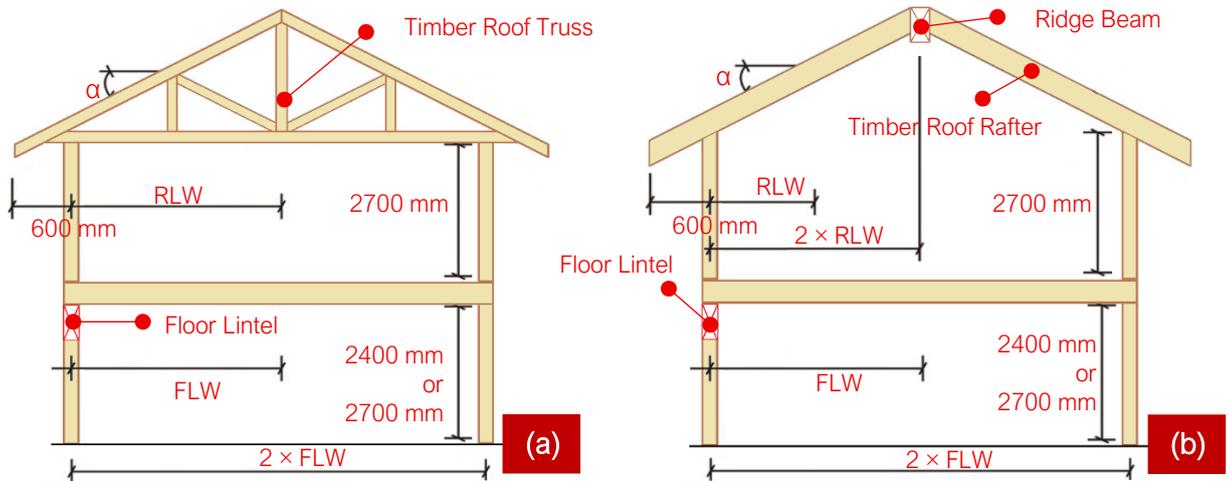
Red Stag Vertix₂₀ floor lintel beam; a) Timber roof truss, b) Timber roof rafter.
